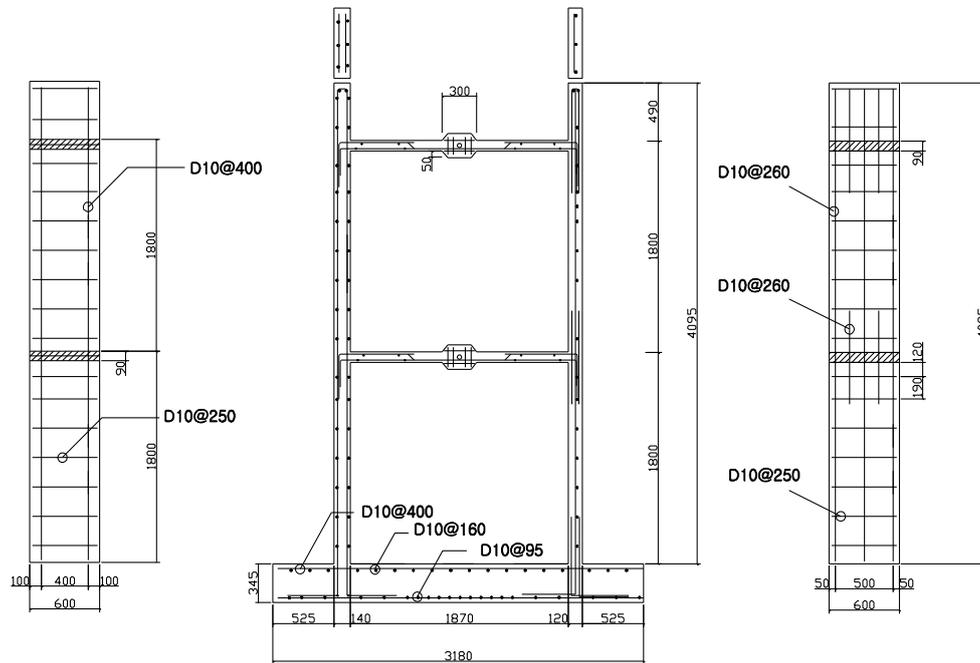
Reinforced arrangement of test-specimen (unit in mm)
